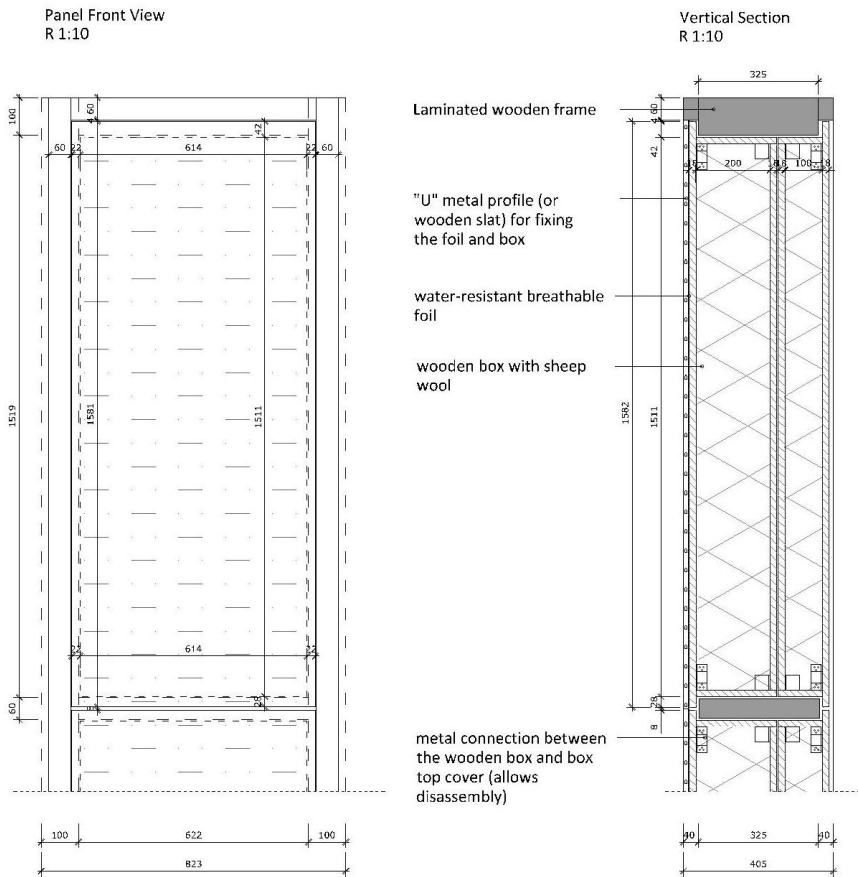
Section through the assembly of insulation boxes of GDC façade wall. (source: 4D architects)
